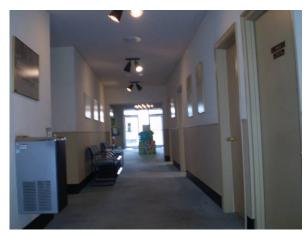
Hallway, Showing Textured Wall, Cream (HA#17) & Cove Base, Brown (HA#19)
